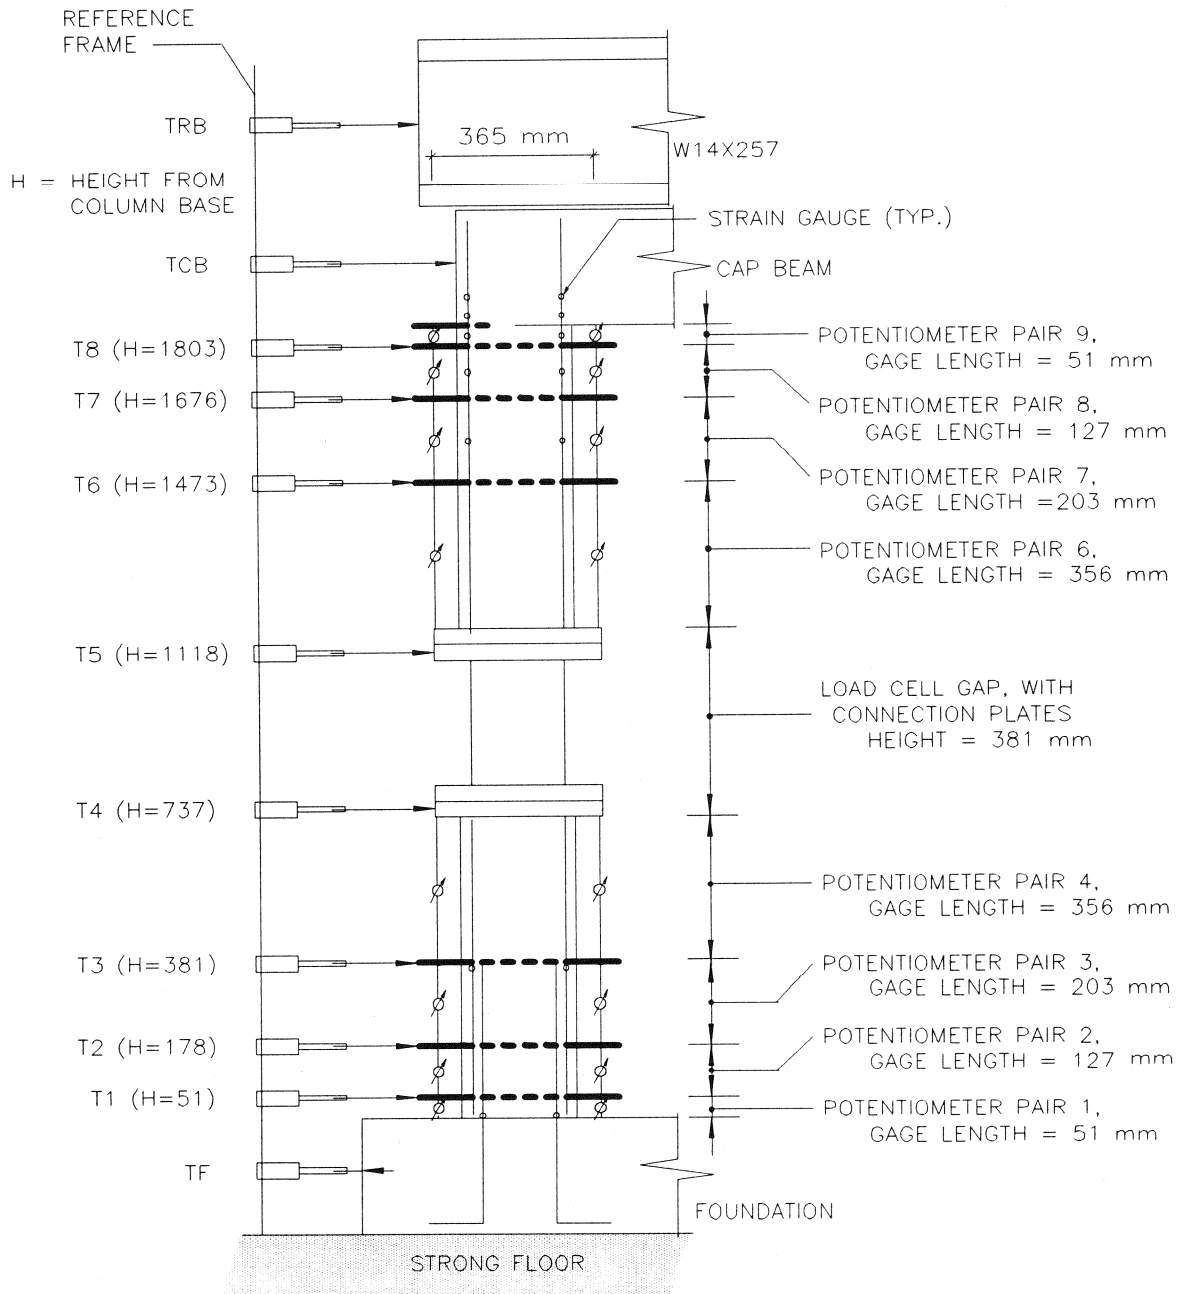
Instrumentation for pre-retrofitted model pier test.
